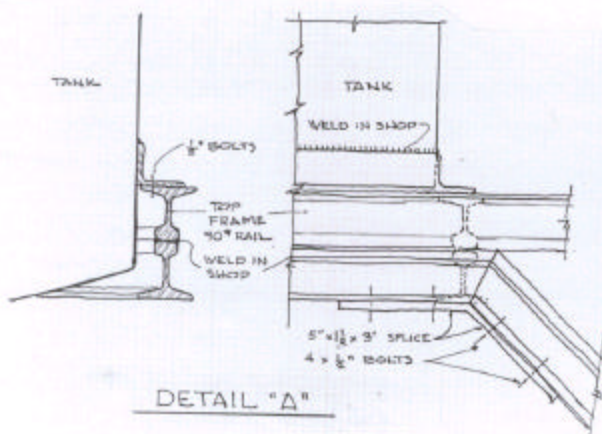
A: Construction details of the sand tower. Not the reuse of 90# rail welded head to toe with extra stiffeners.
